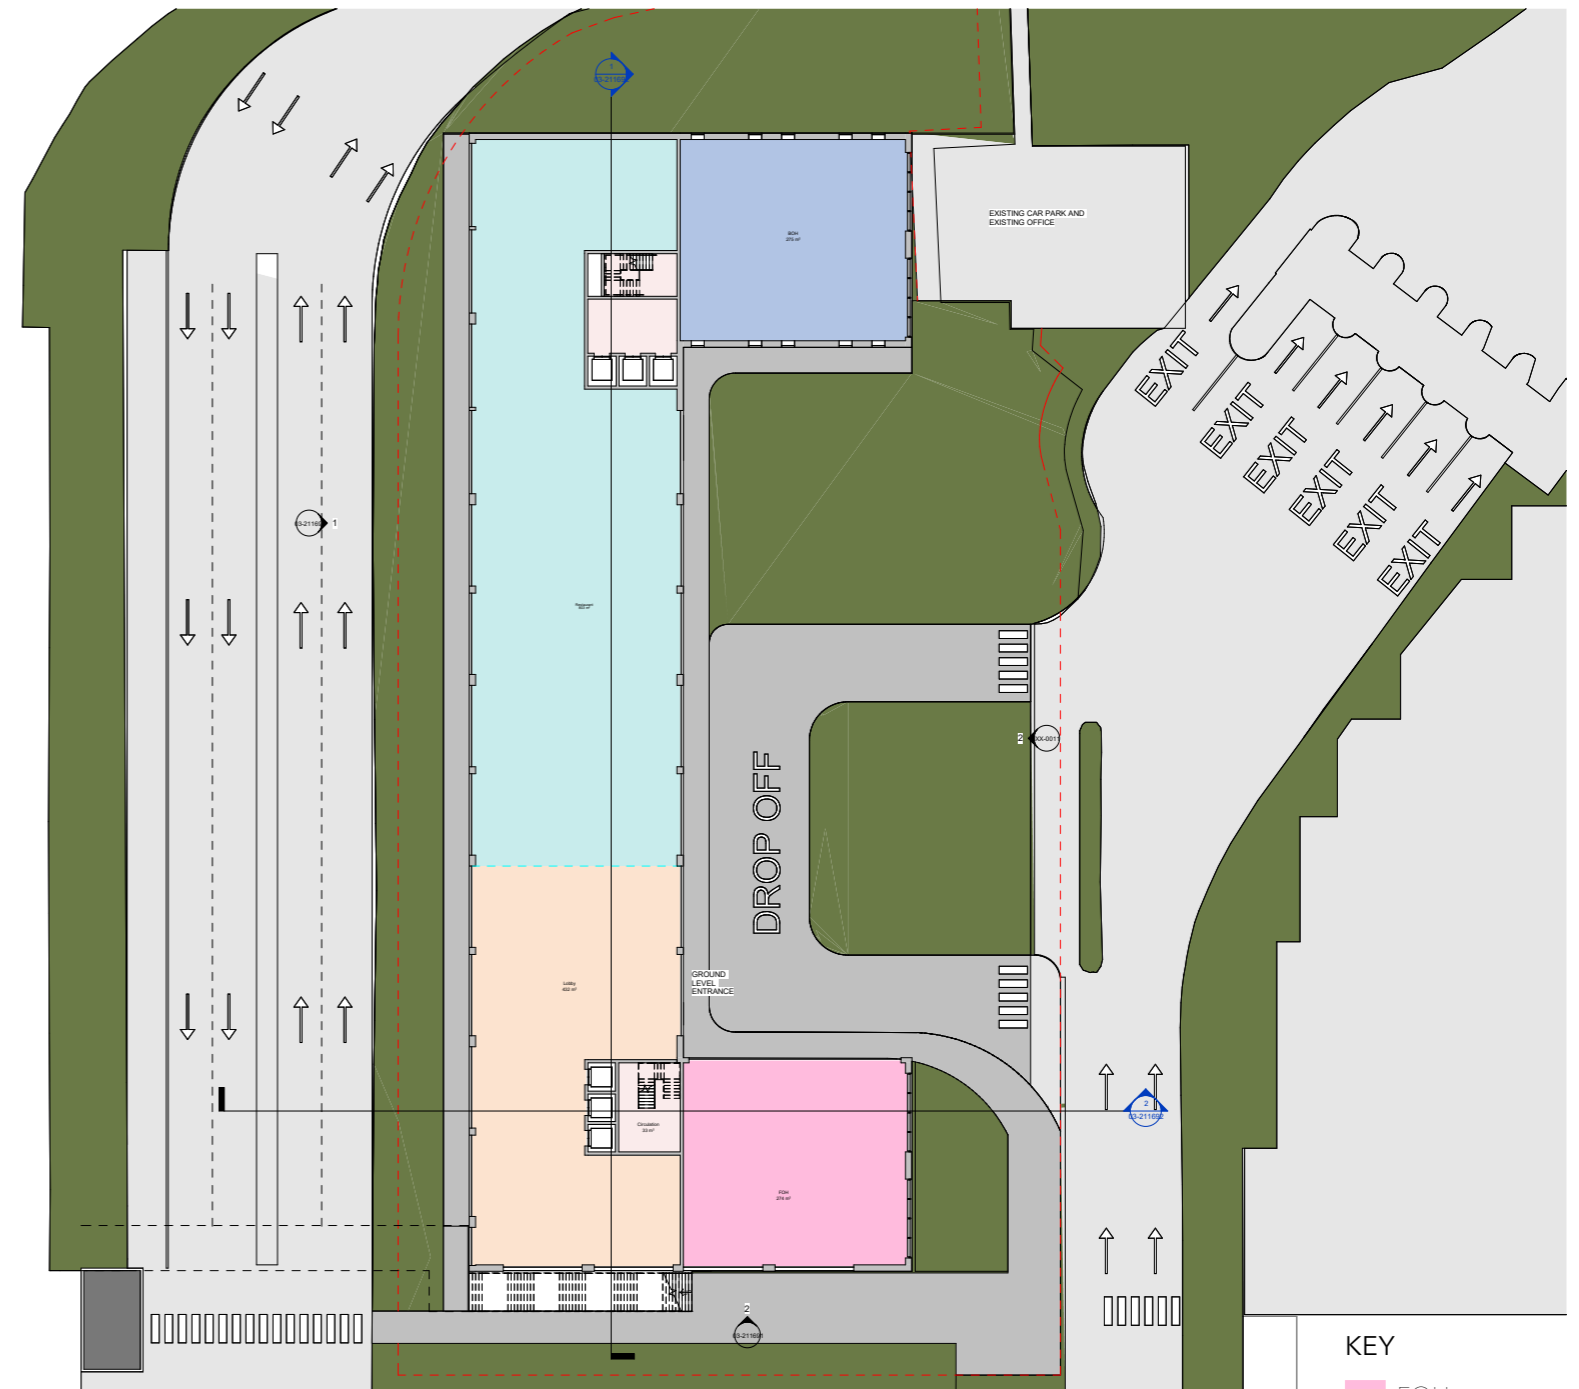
Proposed Plan - South Terminal Forecourt Hotel
